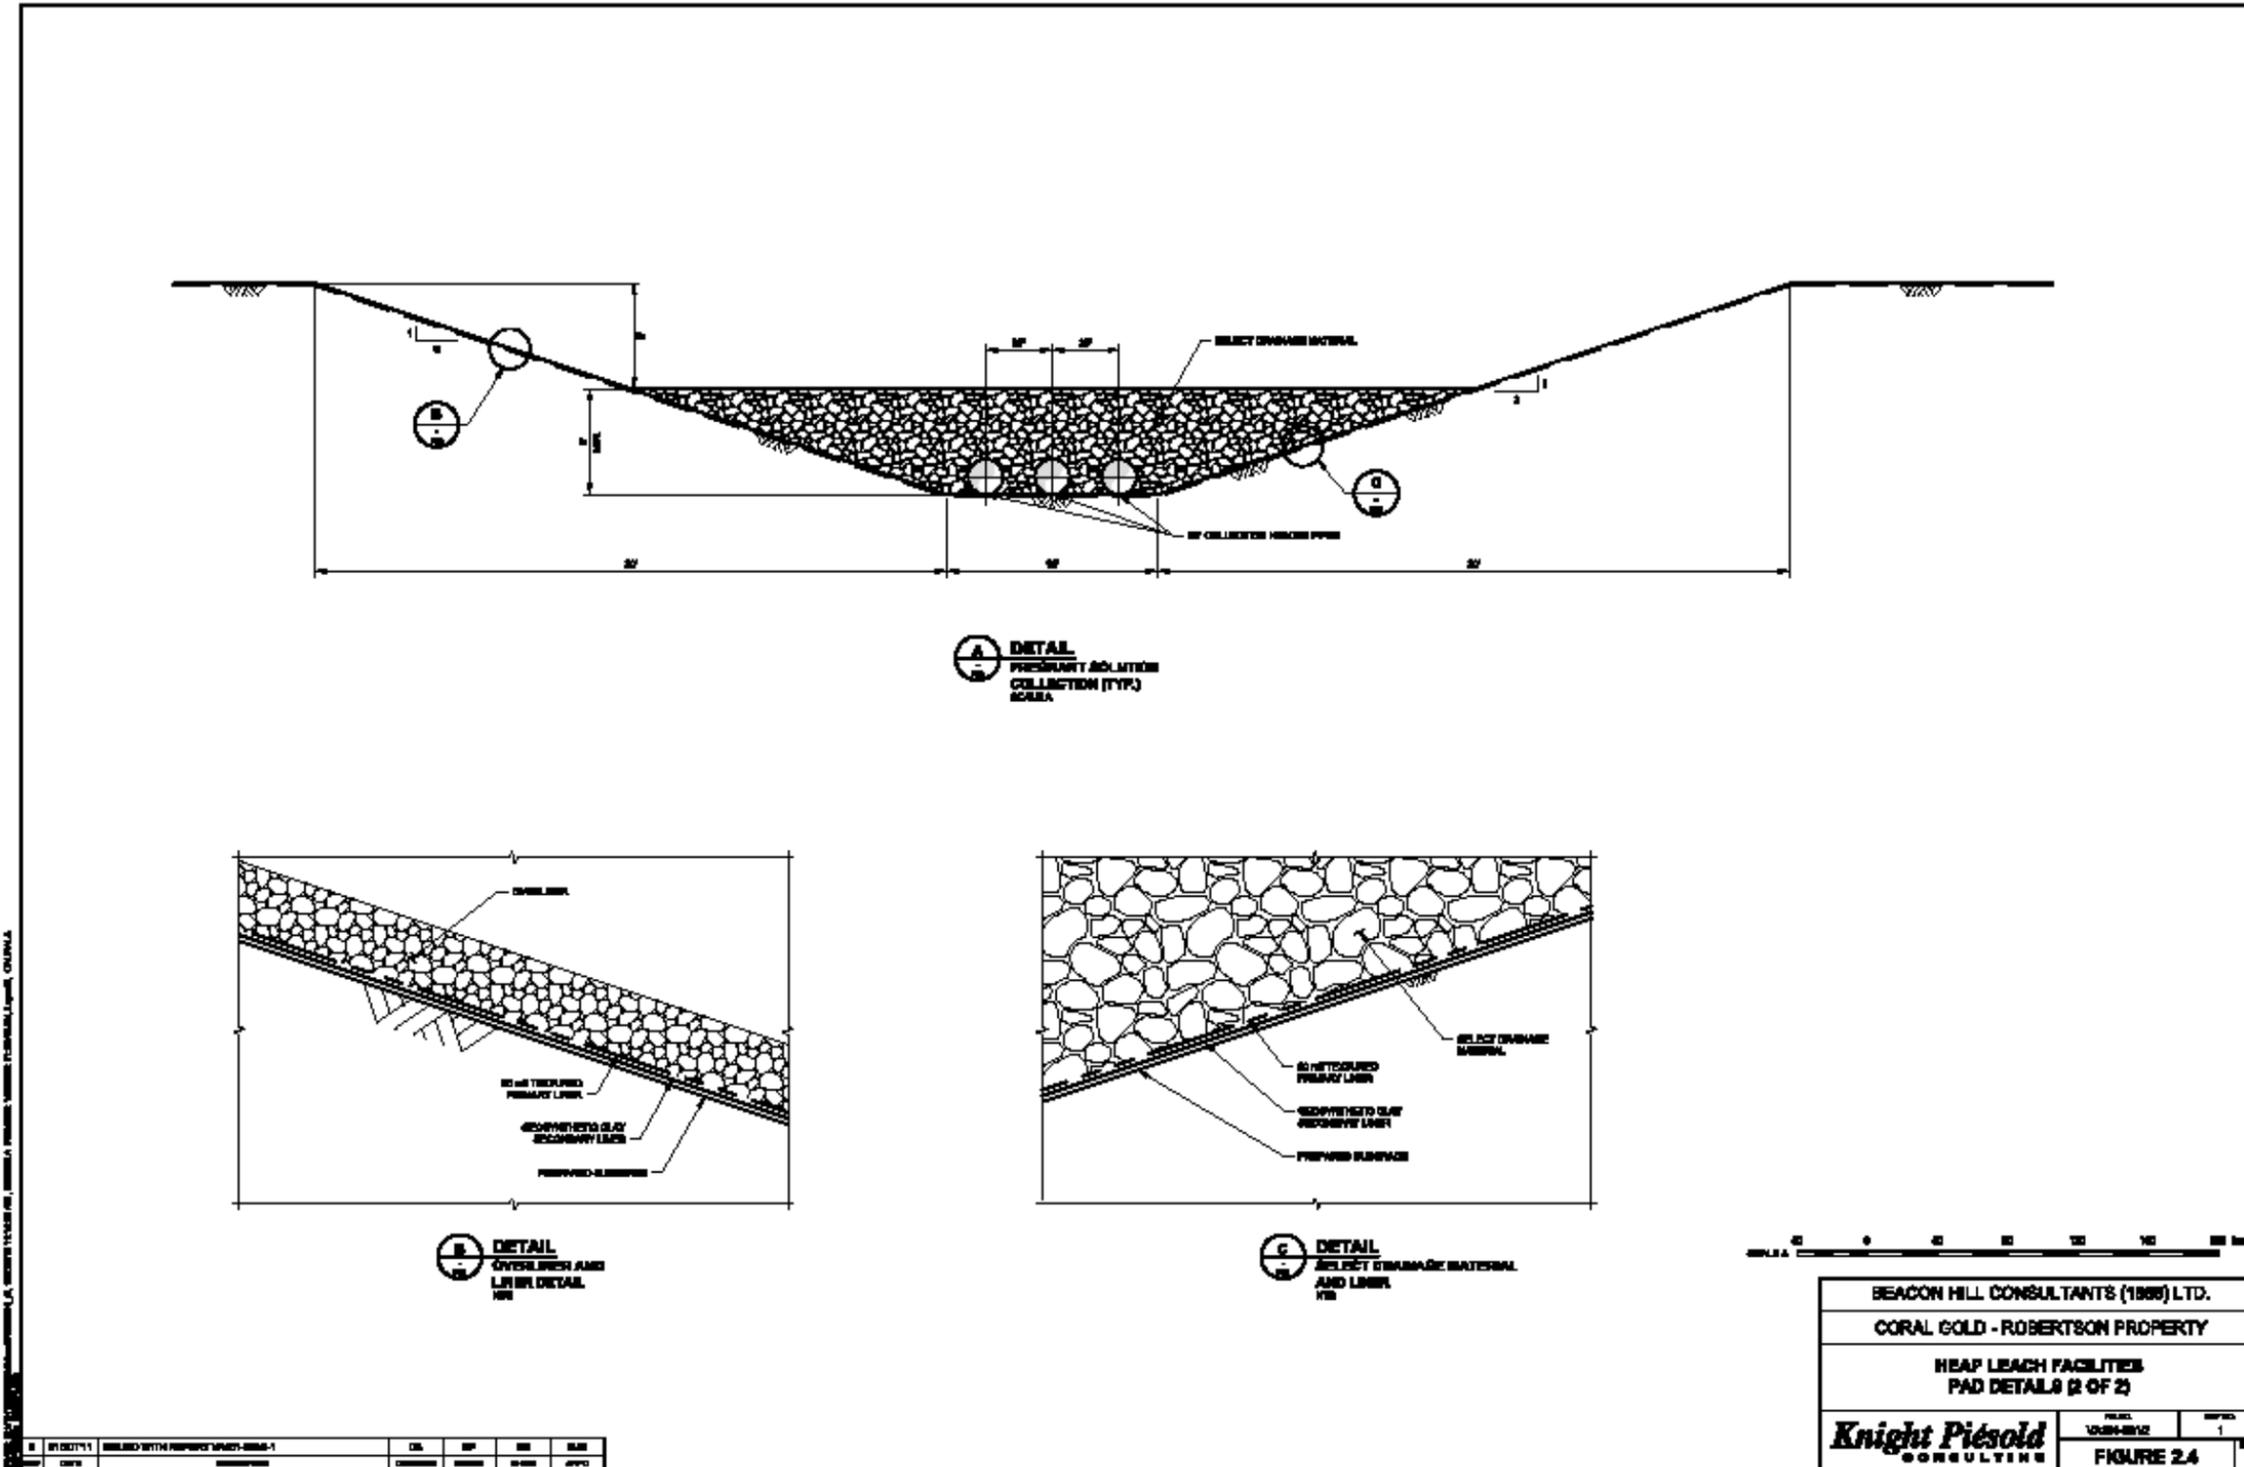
Heap Leach Facilities Pad Details (2 of 2)
